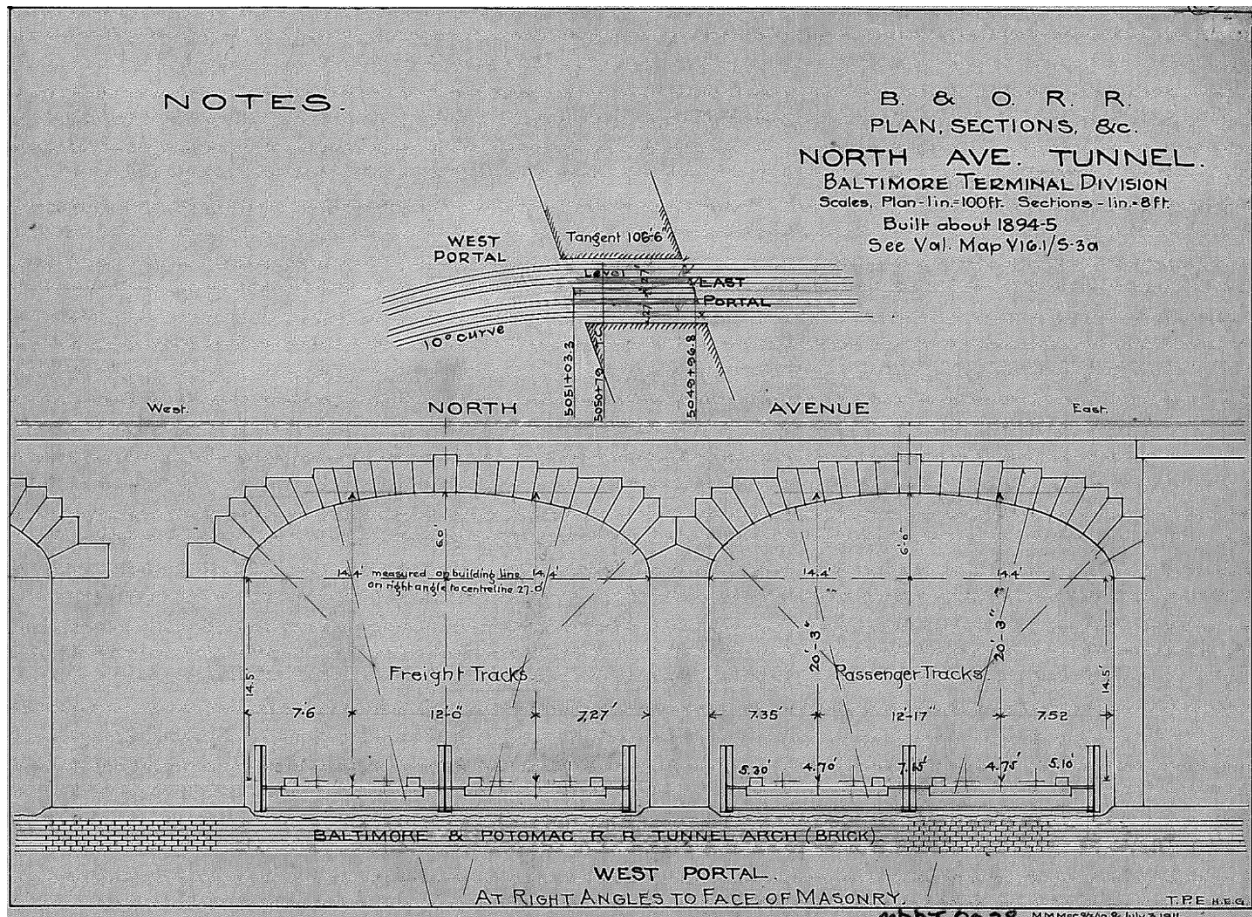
Section drawings showing the B&O Railroad south portals, indicated in the image as the “west portal,” above the B&P Tunnel arch “B&O RR Plan, Sections, &c. North Ave. Tunnel,” 1905 (annotated in 1905, 1910, and 1911). (Drawing courtesy of CSX Transportation.)
